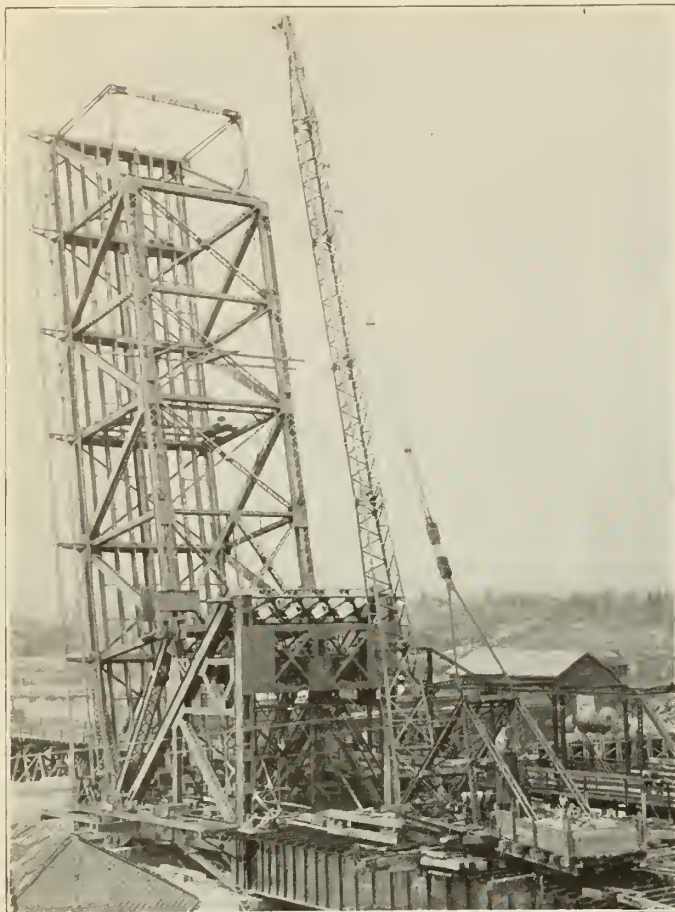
Highway Bascule, Canadian Bridge Company's 180-foot derrick.
